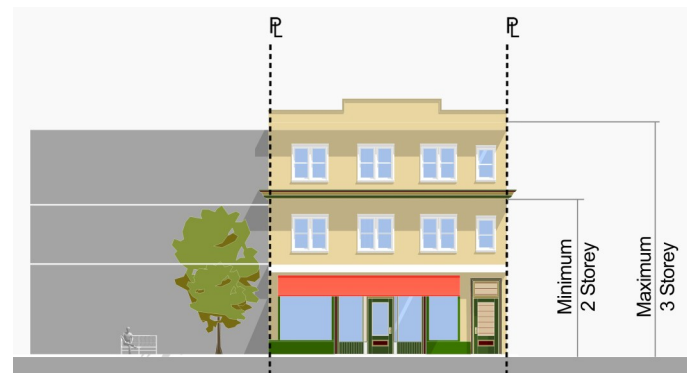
A minimum of 2 storeys and a maximum of 3 storeys is required for buildings fronting onto Lakeshore Road West in the north side of the Village Core. Also in other locations, the maximum is 4 storeys.
